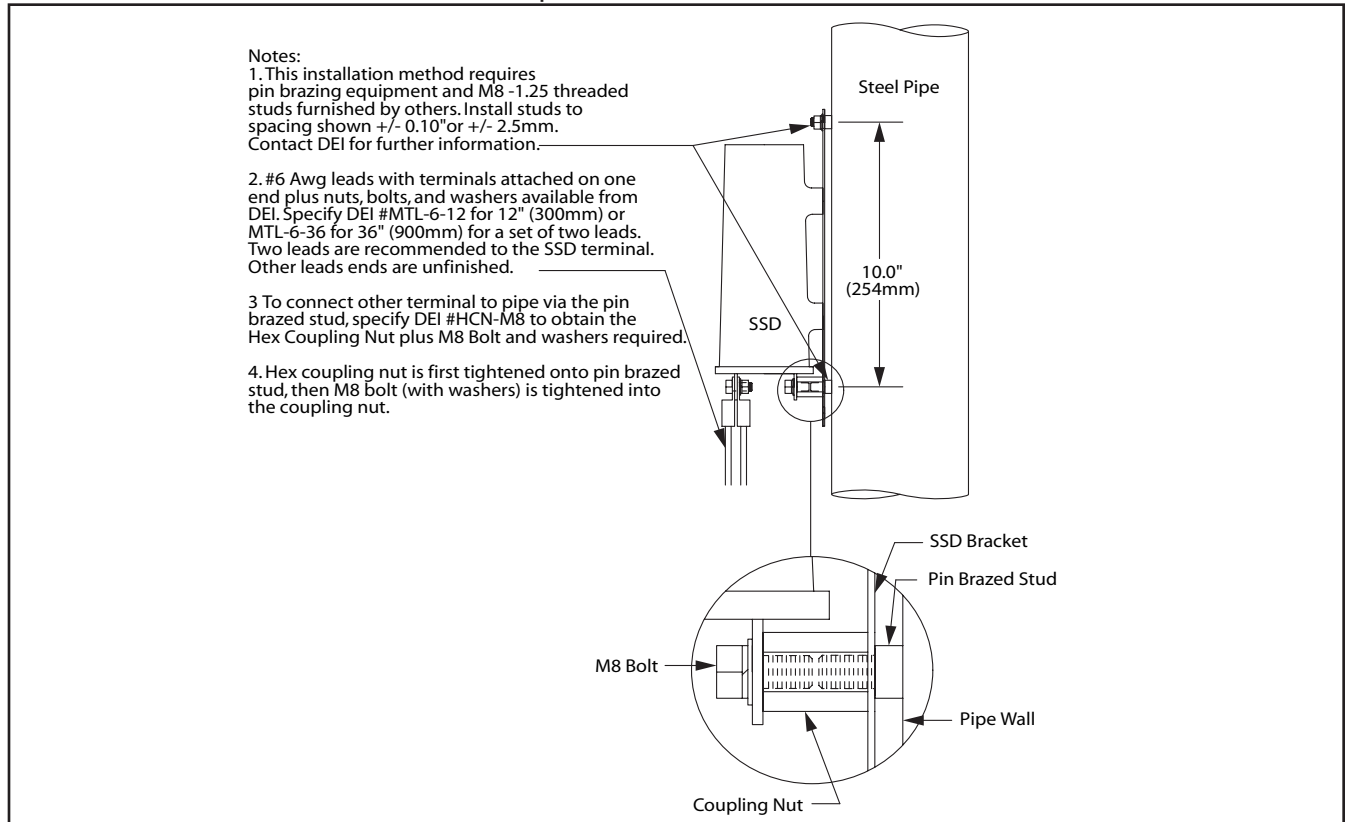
Pin Brazed Stud Connection to a Pipe Wall
